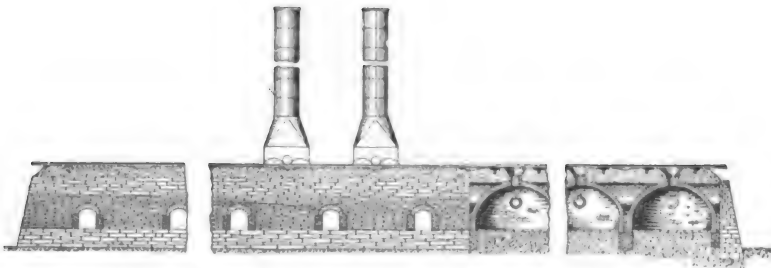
FRONT ELEVATION AND LONGITUDINAL SECTION.
